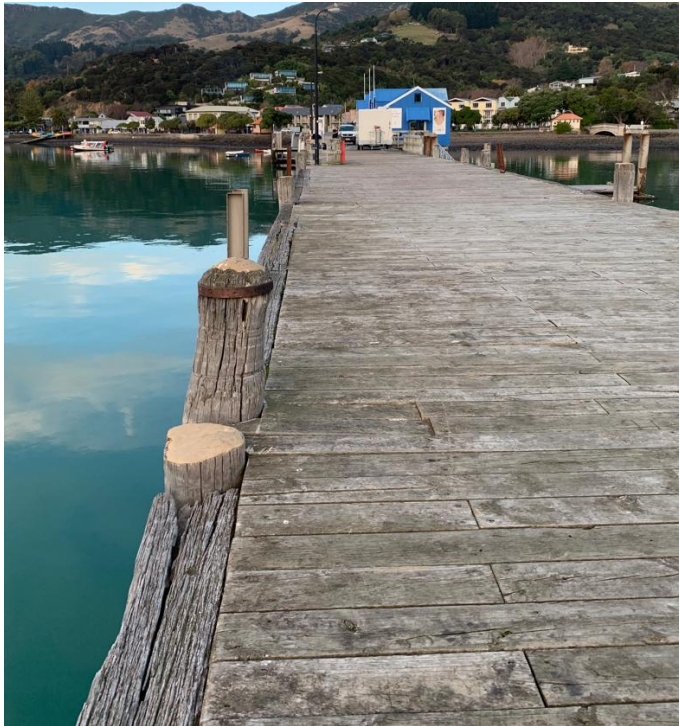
Timber deck kerb on outer edge of the deck planks. Source: South Island Archaeology 2024.
